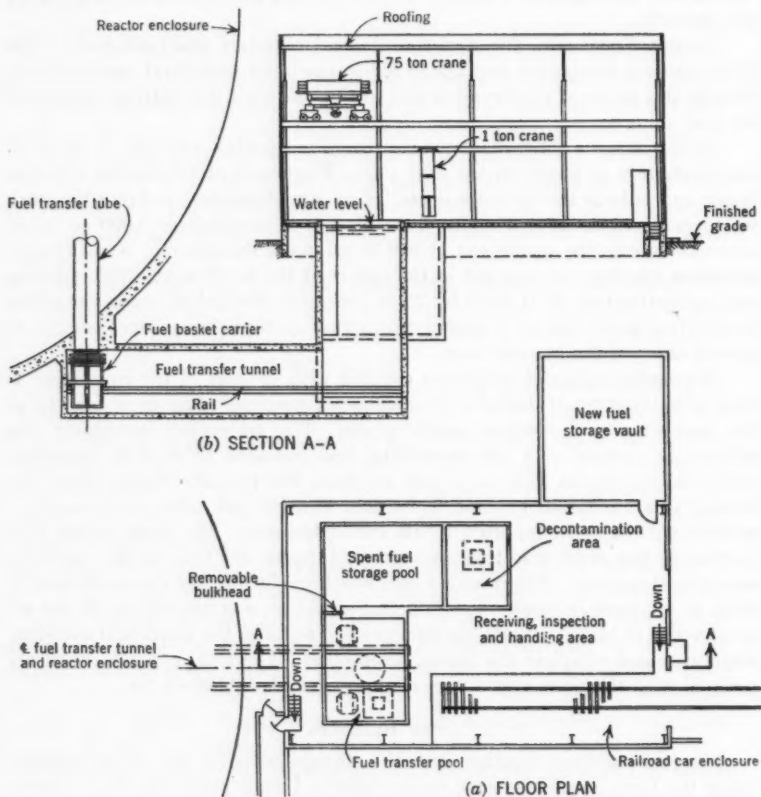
FUEL BUILDING AND STORAGE AREA
